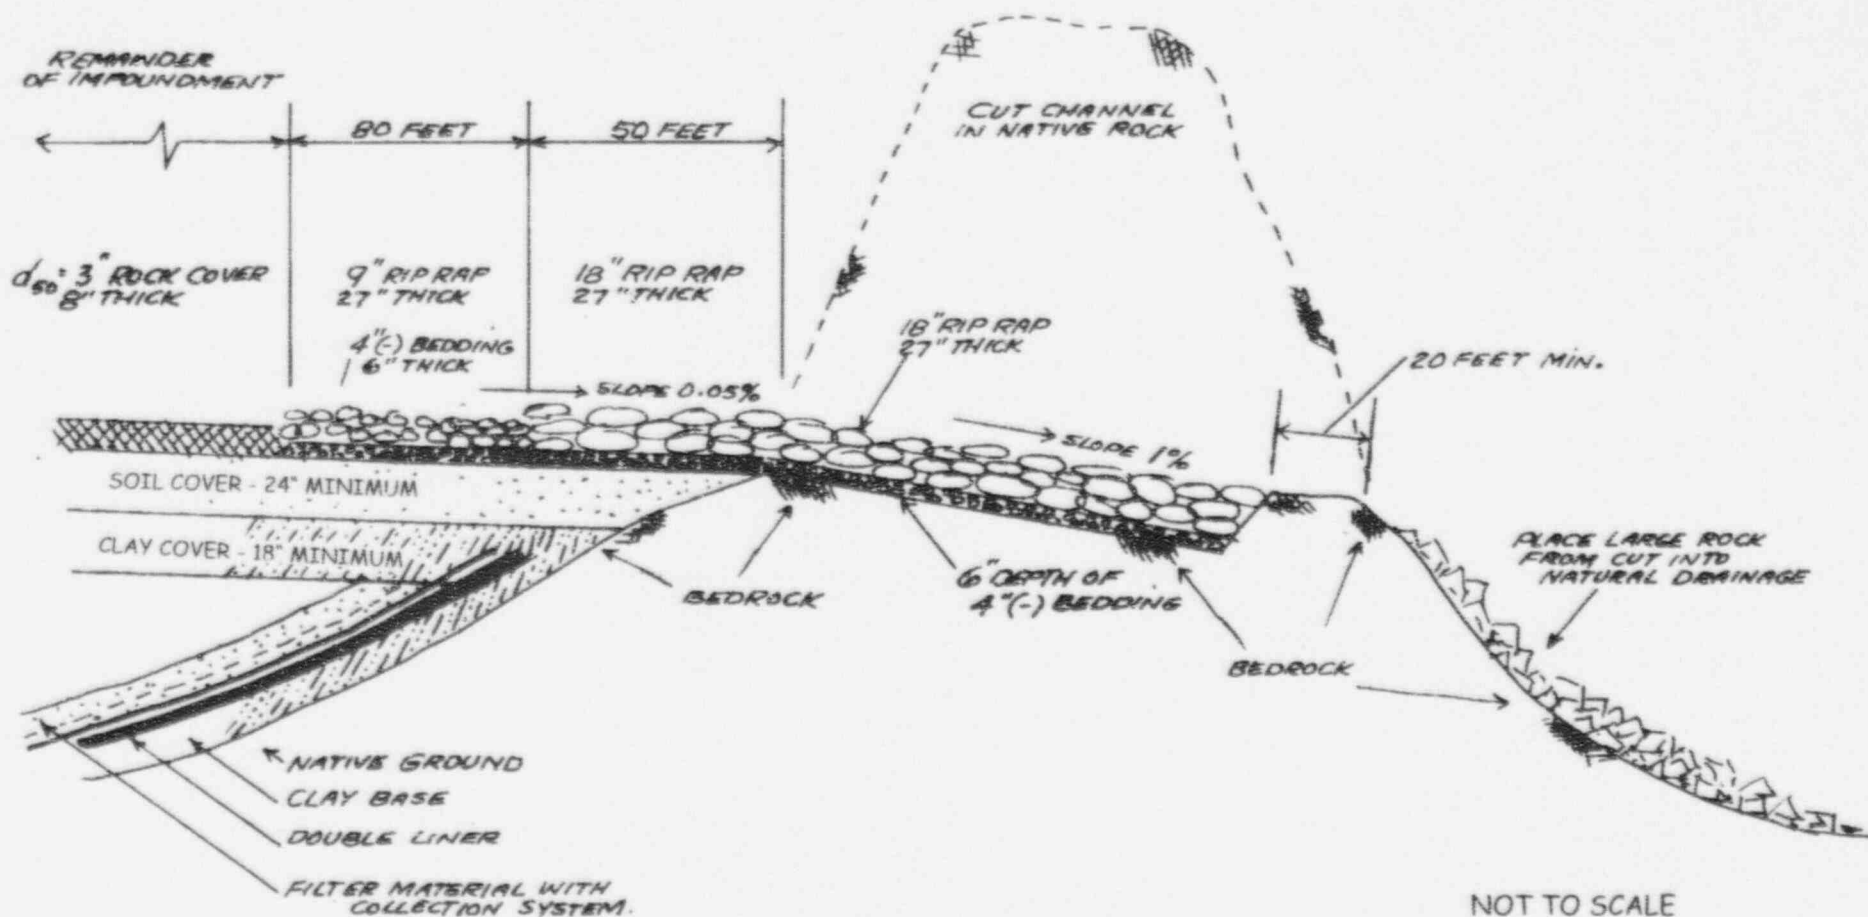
Section (D-D') Typical longitudinal profile of rock cut - not to scale
